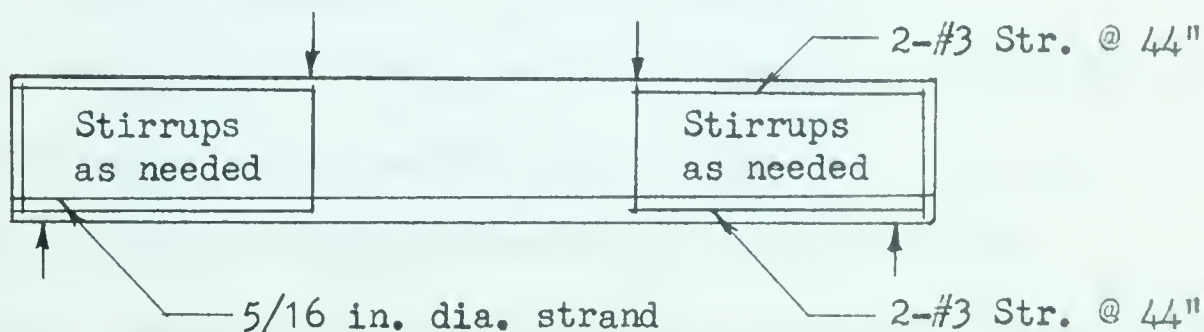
SHEAR REINFORCEMENT FOR BEAMS NO. 1 TO 6.
